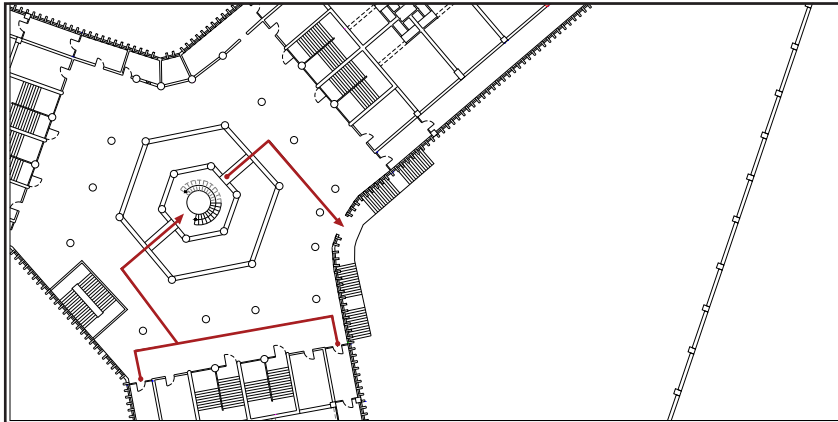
Plan showing the movement path from the third floor to the outdoor courtyard. Source: Author.
